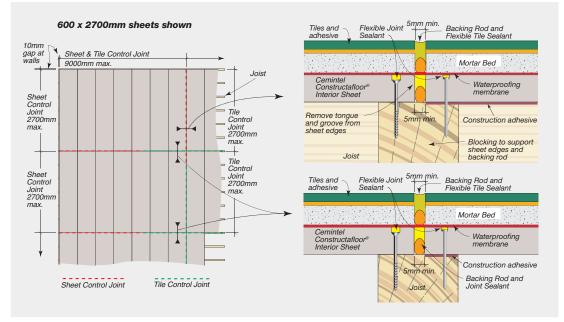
Typical Sheet & Control Joint Layout - Sheets Staggered & Mortar Bed System shown
